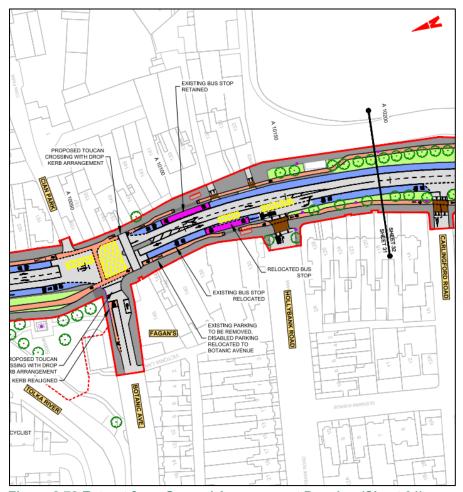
Extract from General Arrangement Drawing (Sheet 31)
